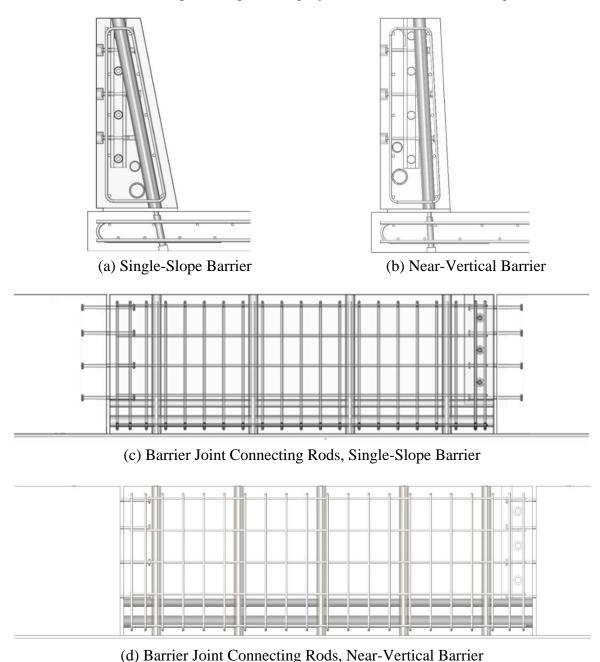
Schematics of Single-Slope and Near-Vertical Barrier Shapes: (a) Single-Slope Barrier; (b) Near-Vertical Barrier(c) Barrier Joint Connecting Rods, Single-Slope Barrier; and (d) Barrier Joint Connecting Rods, Near-Vertical Barrier
